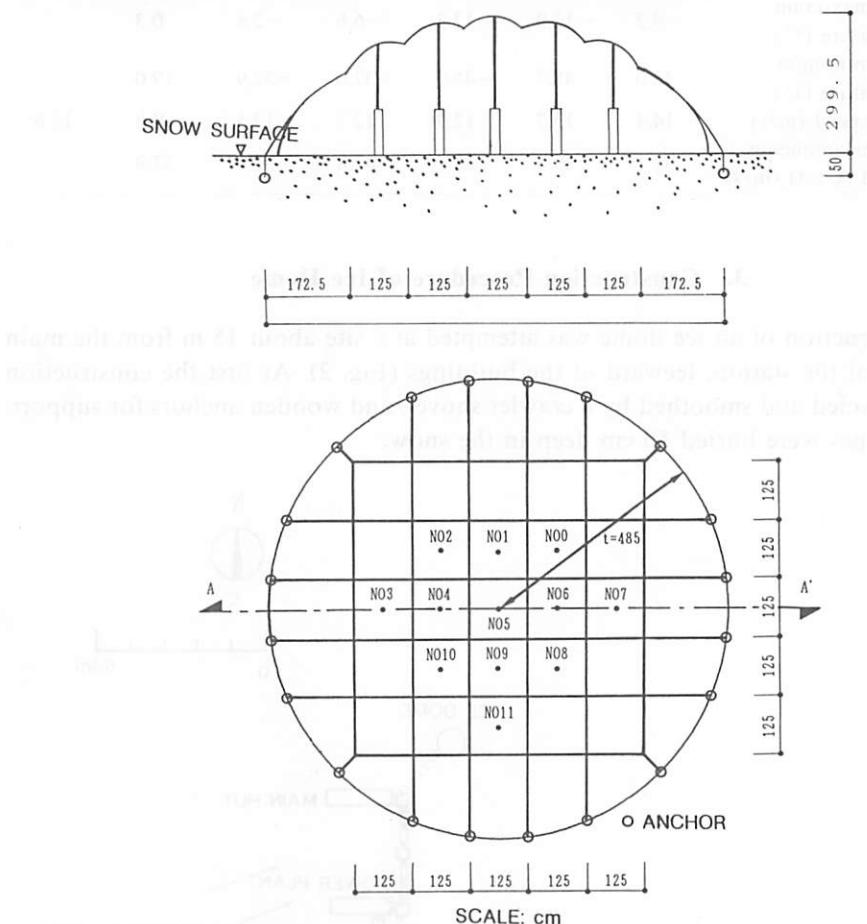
Plane view and vertical section of the ice dome. Twenty anchors were buried in the snow. Dots on the ice dome (NO.0 to NO.11) indicate positions of transducers for displacement between the snow floor and the ceiling.
